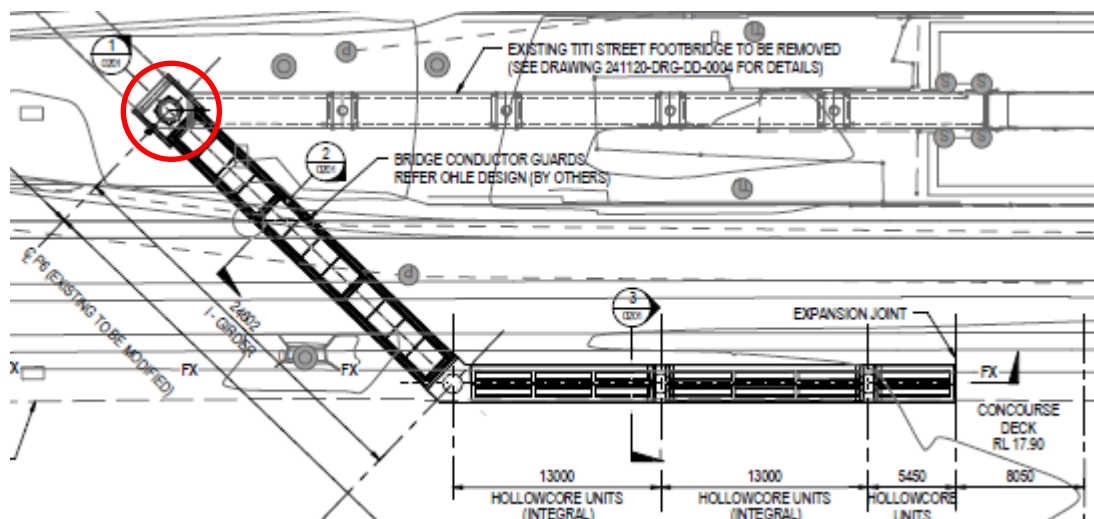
Titi St bridge plan, note the existing pier circled in red to be modified.
